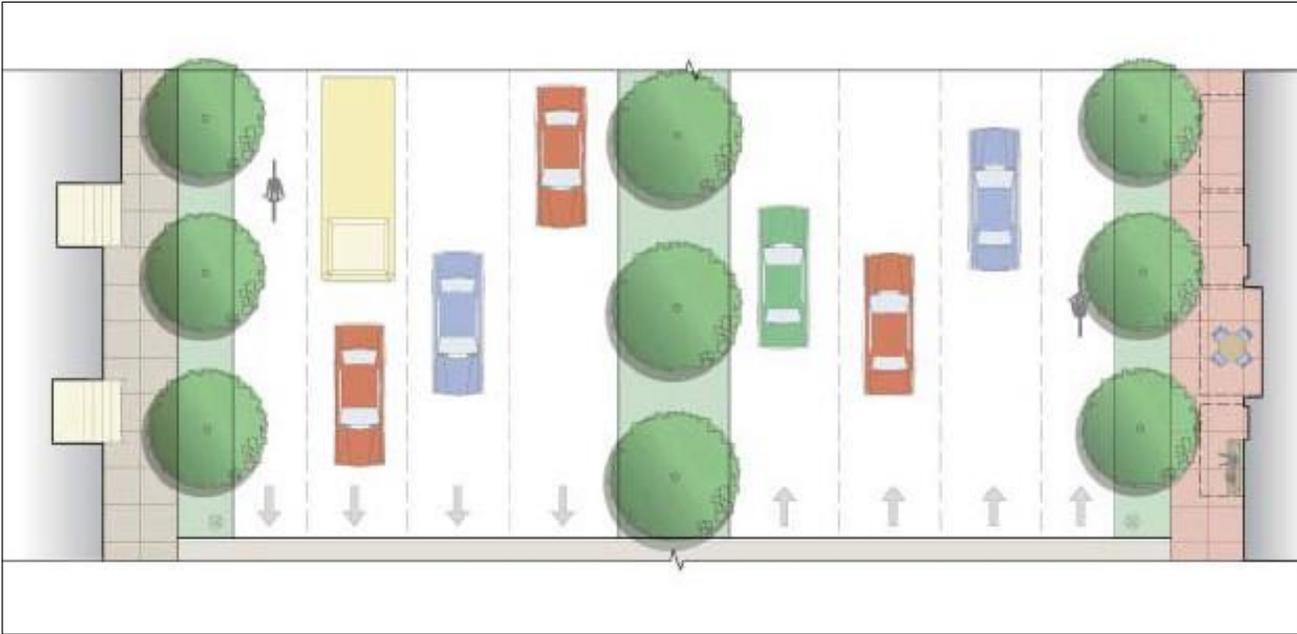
Long-Term Alternative 1, Watt Avenue Concept Plan
